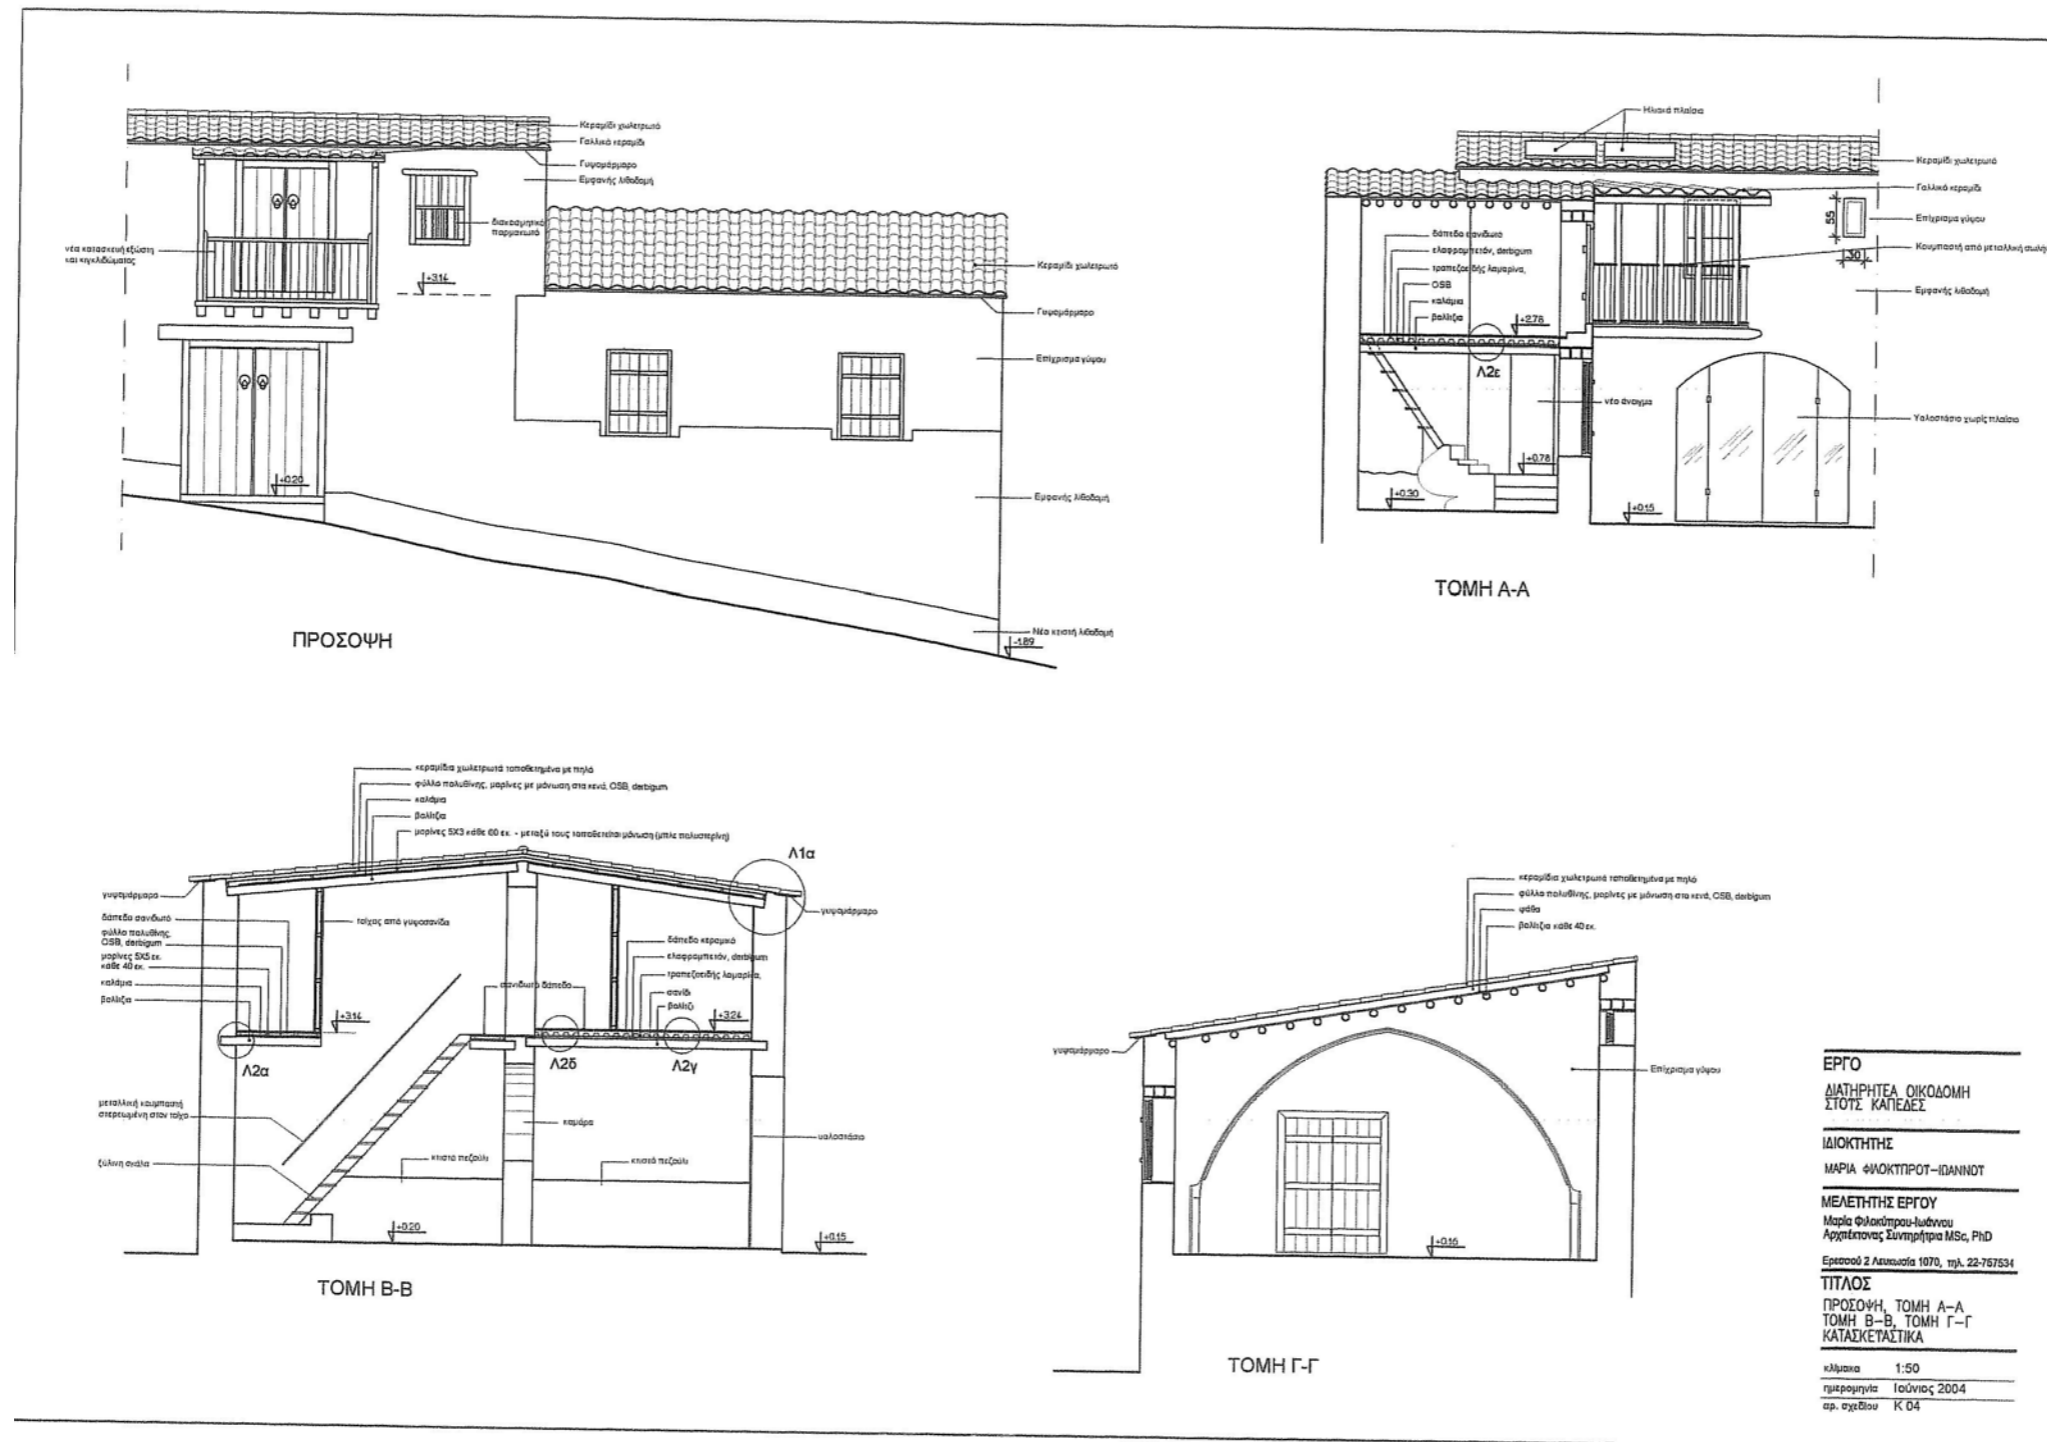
Main elevation and sections of the vernacular dwelling – Proposal for the restoration and reuse. © M. Philokyrou
